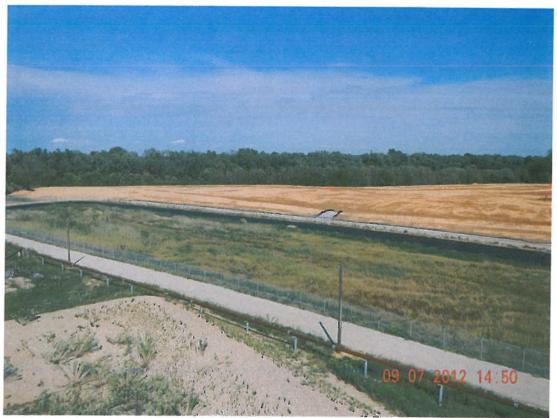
🚣 - Placing rip rap for paved gutter facing north
